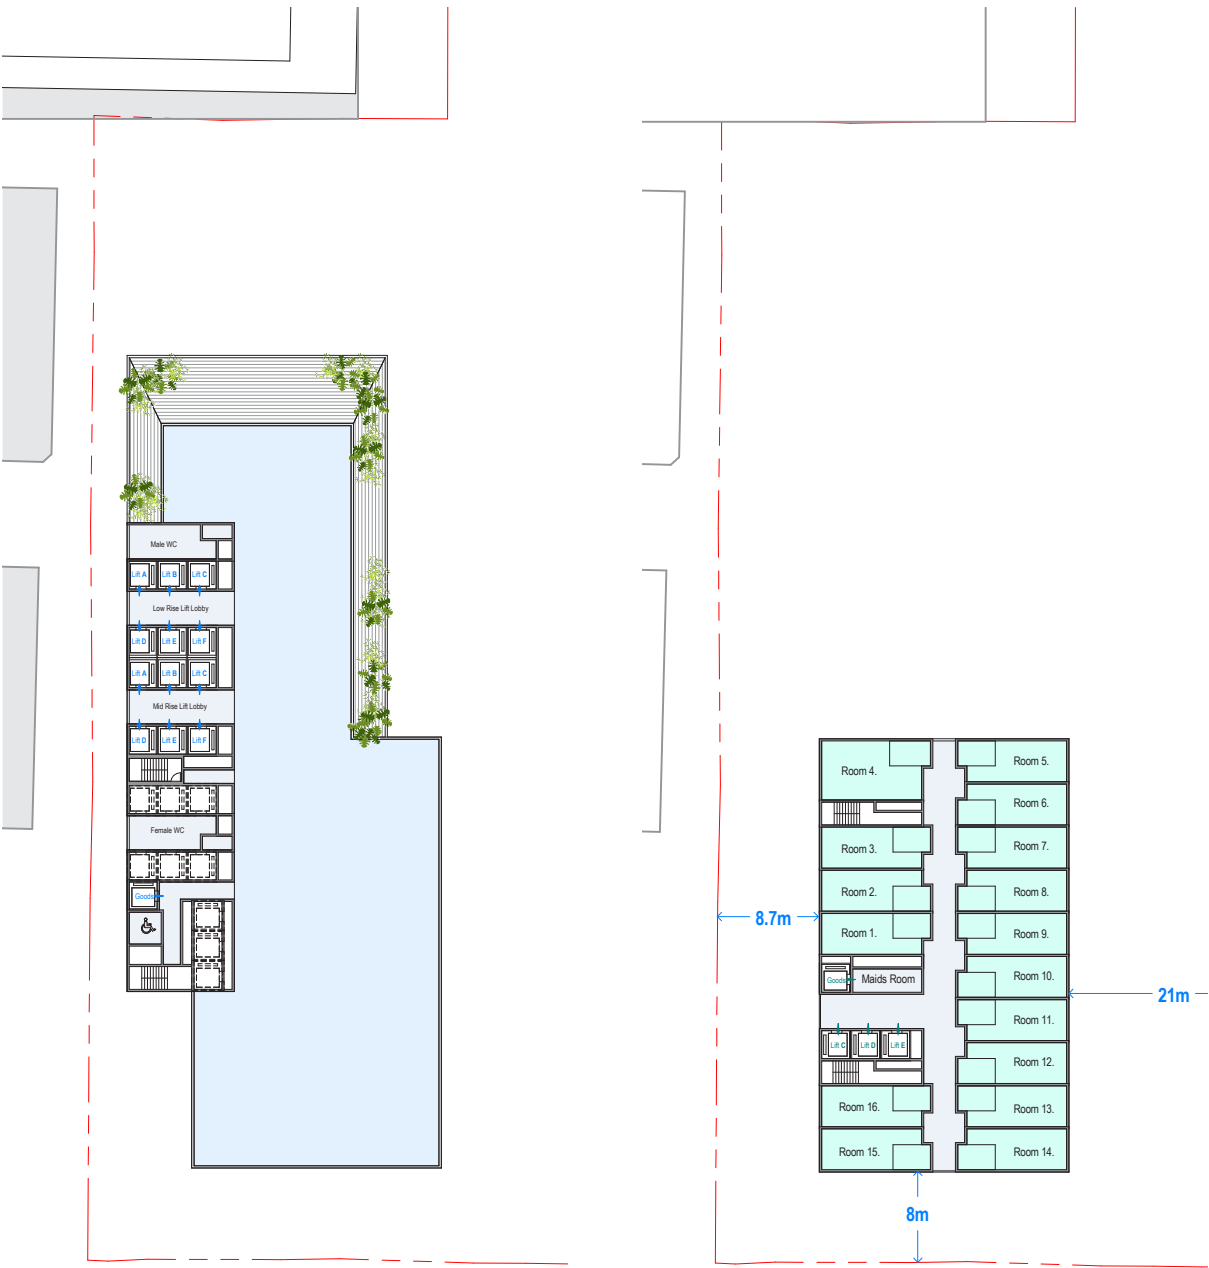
Indicative floor plan - commercial transfer floor low-rise/mid-rise
